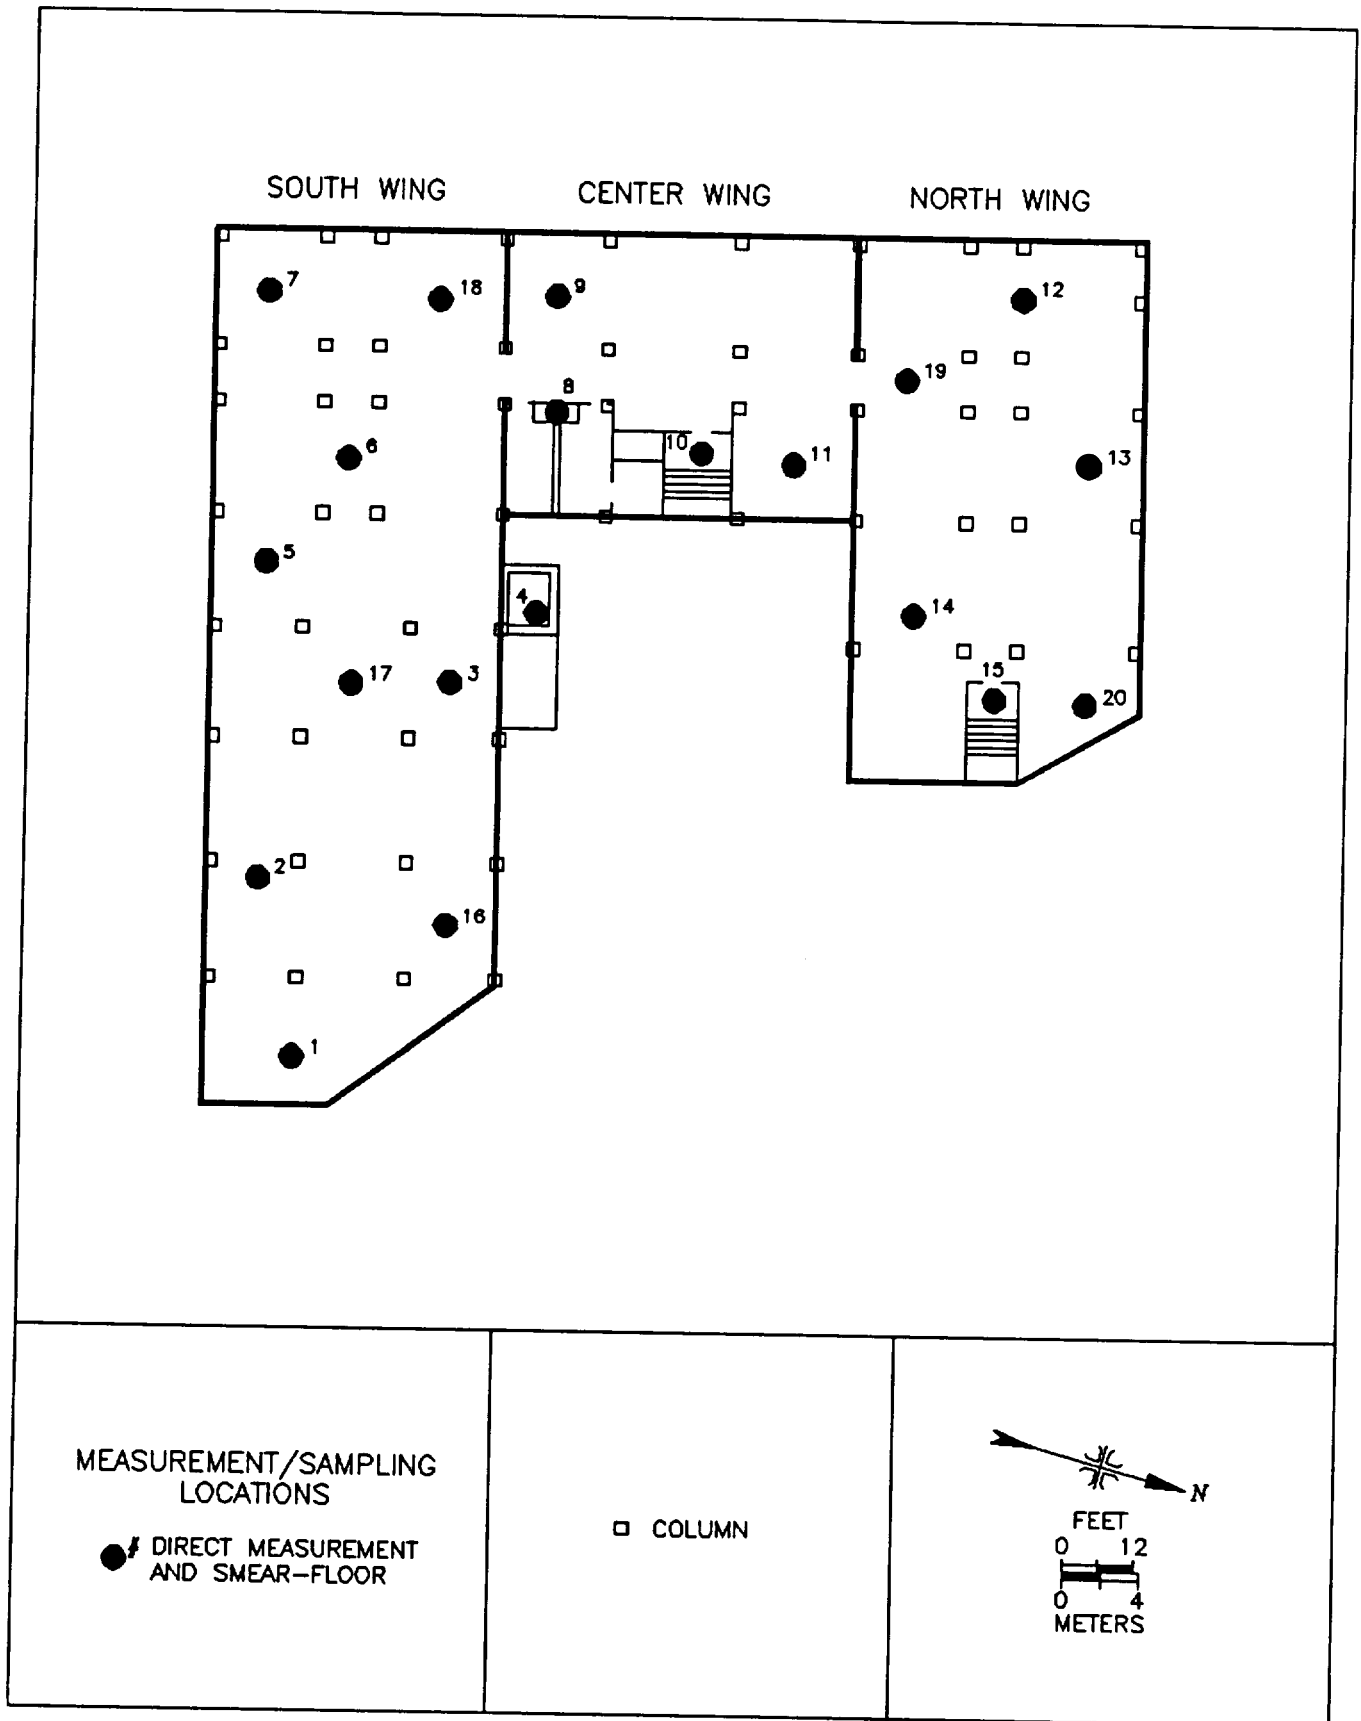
Building 7 Second Floor – Measurement and Sampling Locations
